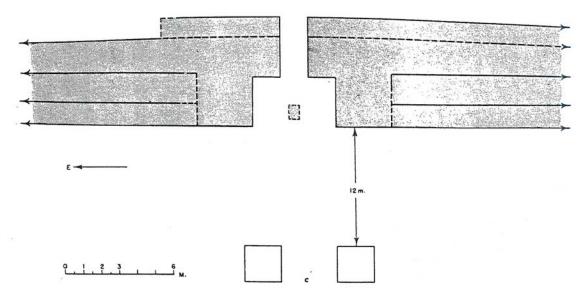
Plan drawing of Gate EE (modified after Shook 1952:Figure 1f).
